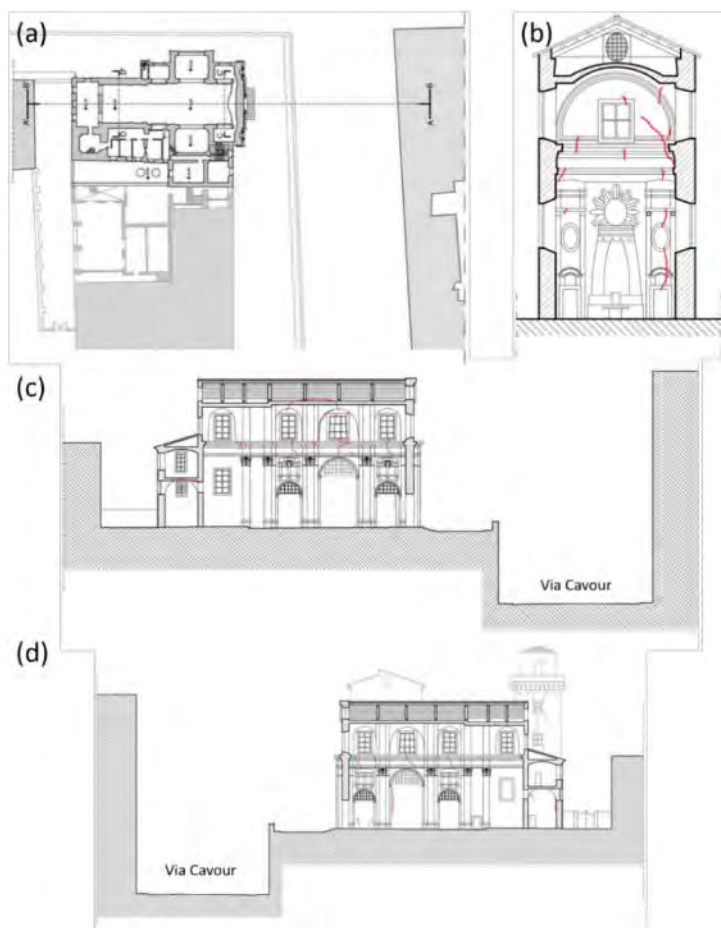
(a) plan view of the church and location of the cross sections shown in subpanels b–d, (b) section of the altar area, (c) section of the church looking east, and (d) section of the church looking west and extensional cracks visible in 2016.
